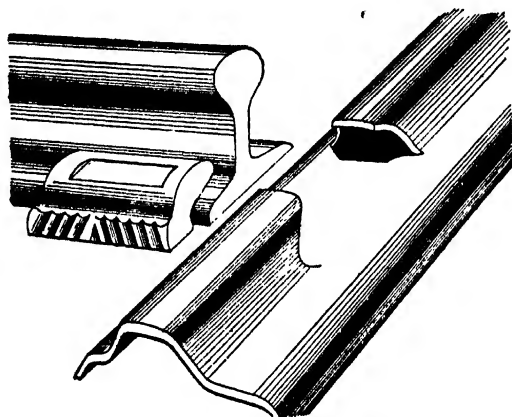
Light Steel Railway (views showing method of securing Rails to Sleepers).
